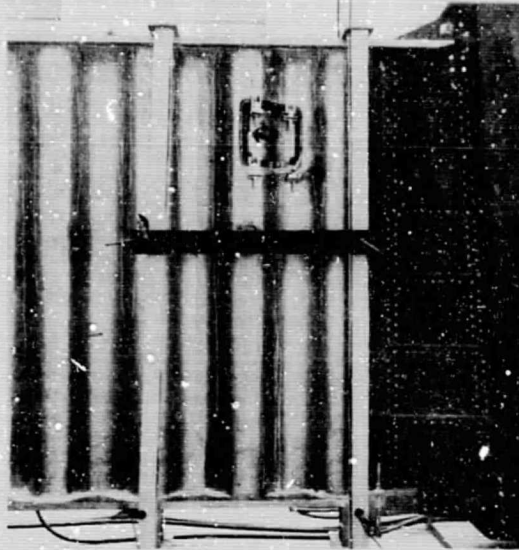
CROSSBEAM SECTION SHOWING JACKING SYSTEM USED TO ELIMINATE HORIZONTAL DEFORMATION DUE TO THE WEIGHT OF THE BEAM
